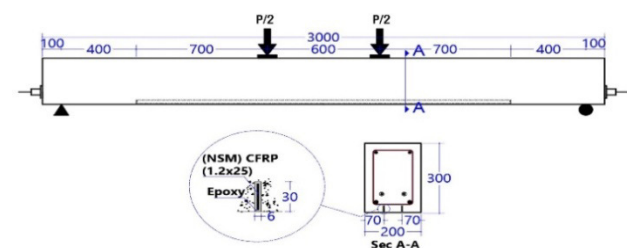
Details of CFRP-NSM strengthened girders (all dimensions are in mm).
